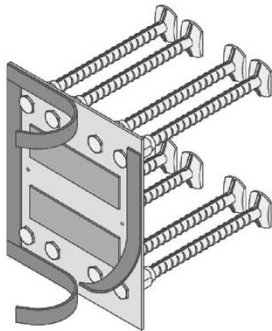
Apply circumferential sealing made of flexible foam tape (assembling accessory)
